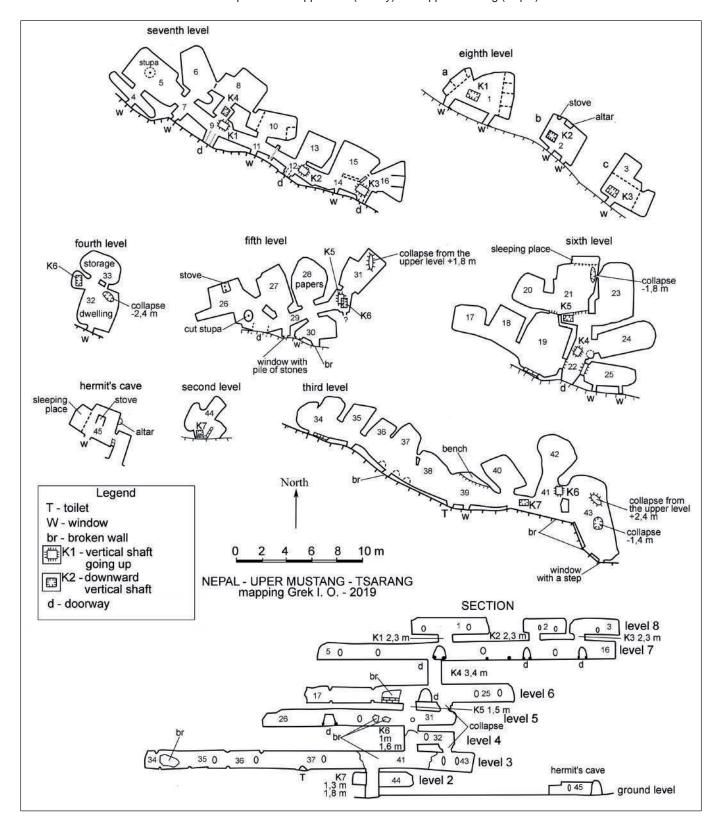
Tsarang (Charang). Plan and section of the underground system (mapping I. Grek, 2019, drawing N. Moldavska).
